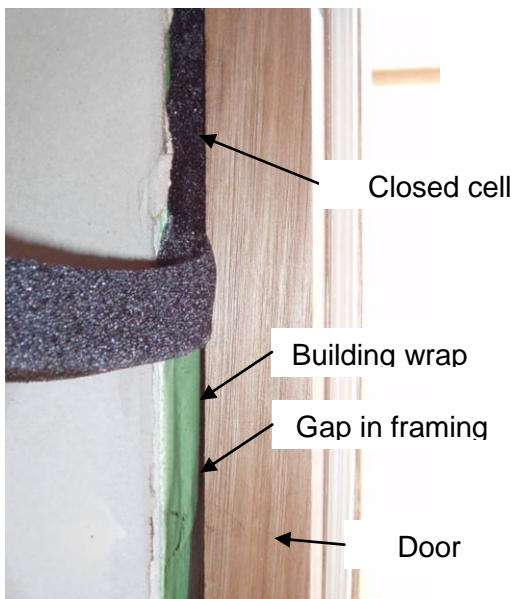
The installation of closed cell foam rubber in gap between door jamb and wall frame
